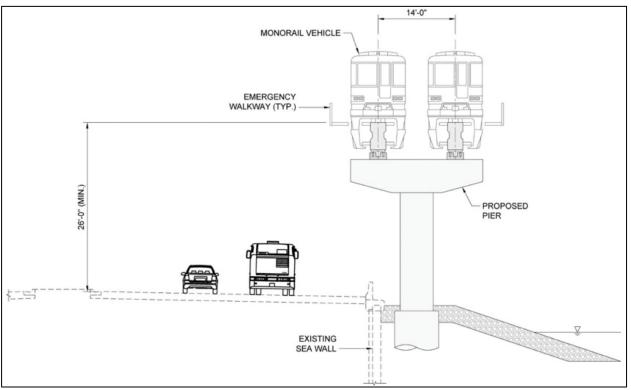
Monorail Typical Section – Bay Crossing Trunkline
